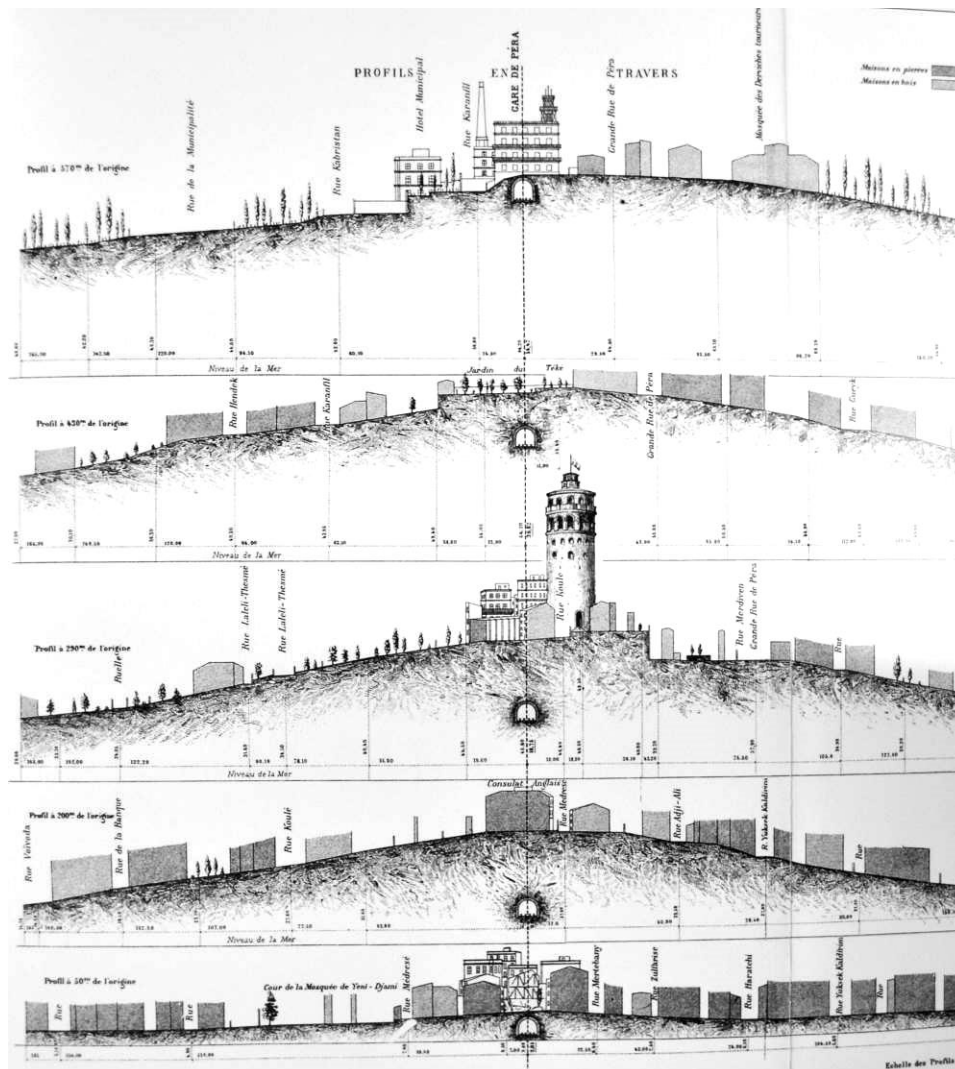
Longitudinal cross sectional views of Tünel (Gavand 1876)
